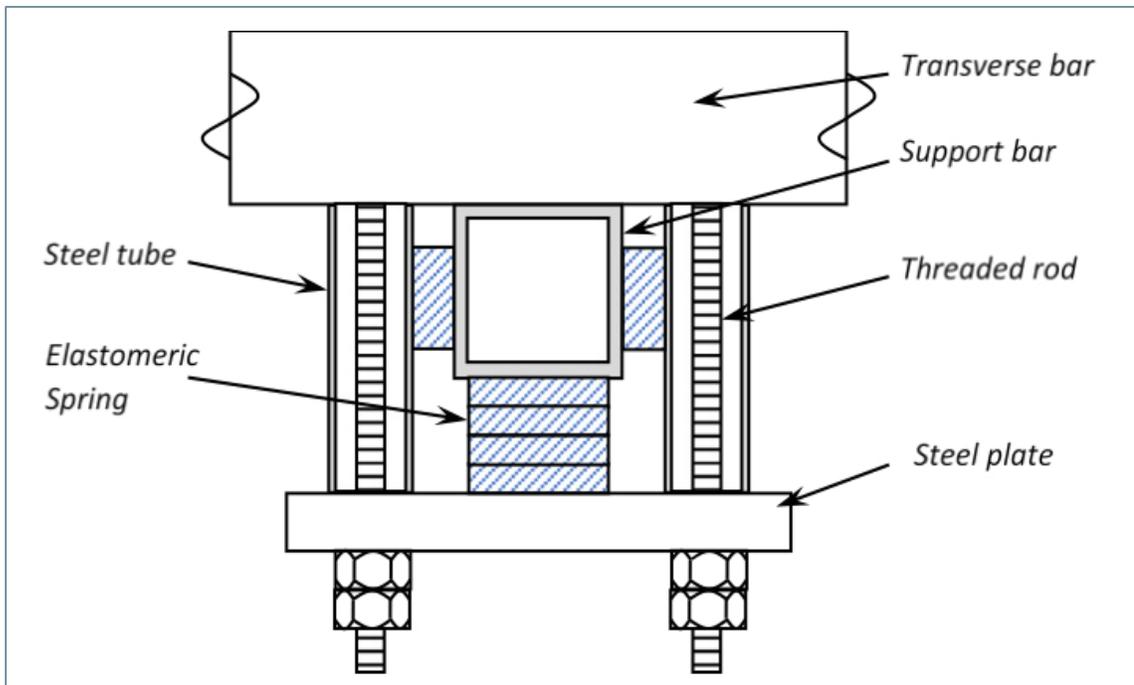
Bolted fix for failed welded stirrup in modular joint (OR)
